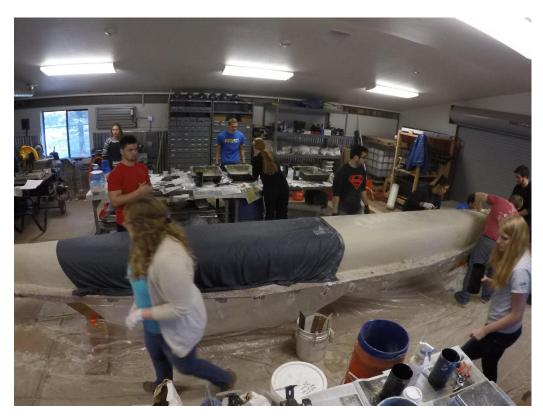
Preparing for First Primary Reinforcement: To keep the concrete moist, a damp cloth was placed over the area where reinforcement was not prepared to be placed.
